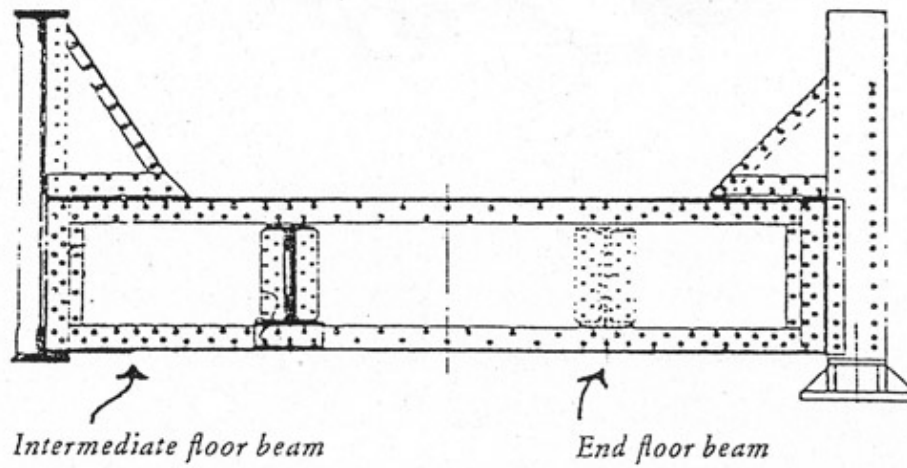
Detail, Typical Metal Plate Girder Bridge
